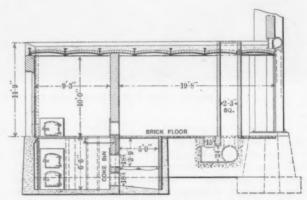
Sectional Elevation Through Oven No. 1 and the Firing Room for Both Ovens.
